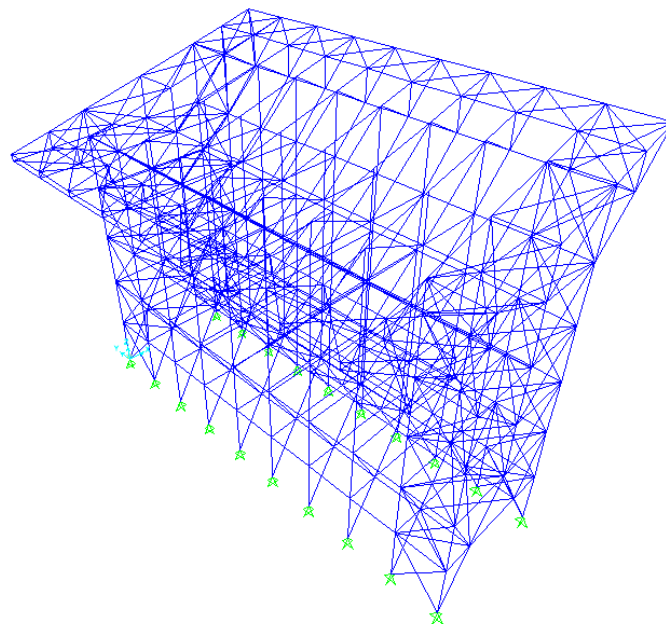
Isometric view of the 3D SAP2000 model of the framed structure for structural analysis
